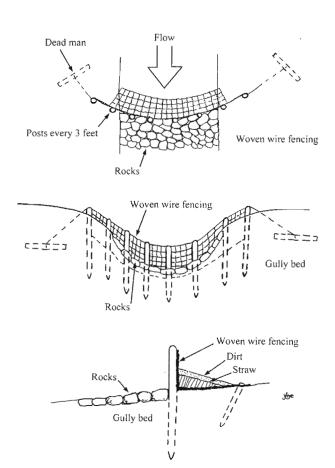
B. Plan, cross-section, and side views of single-fence gabion. Adapted from "Recommendations for the Control and Reclamation of Gullies." Note: Dead-man anchors are often unnecessary in smaller drainages.
